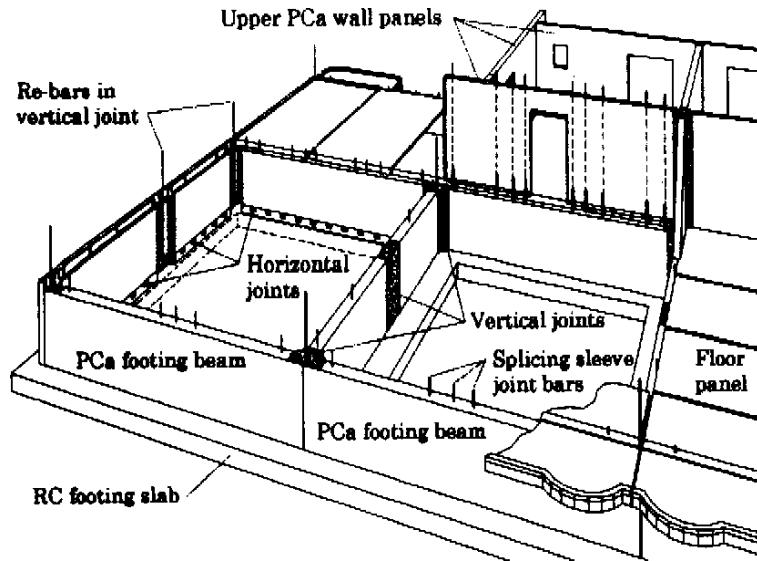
PCA concrete construction system of footing beams for PCA walled structures
